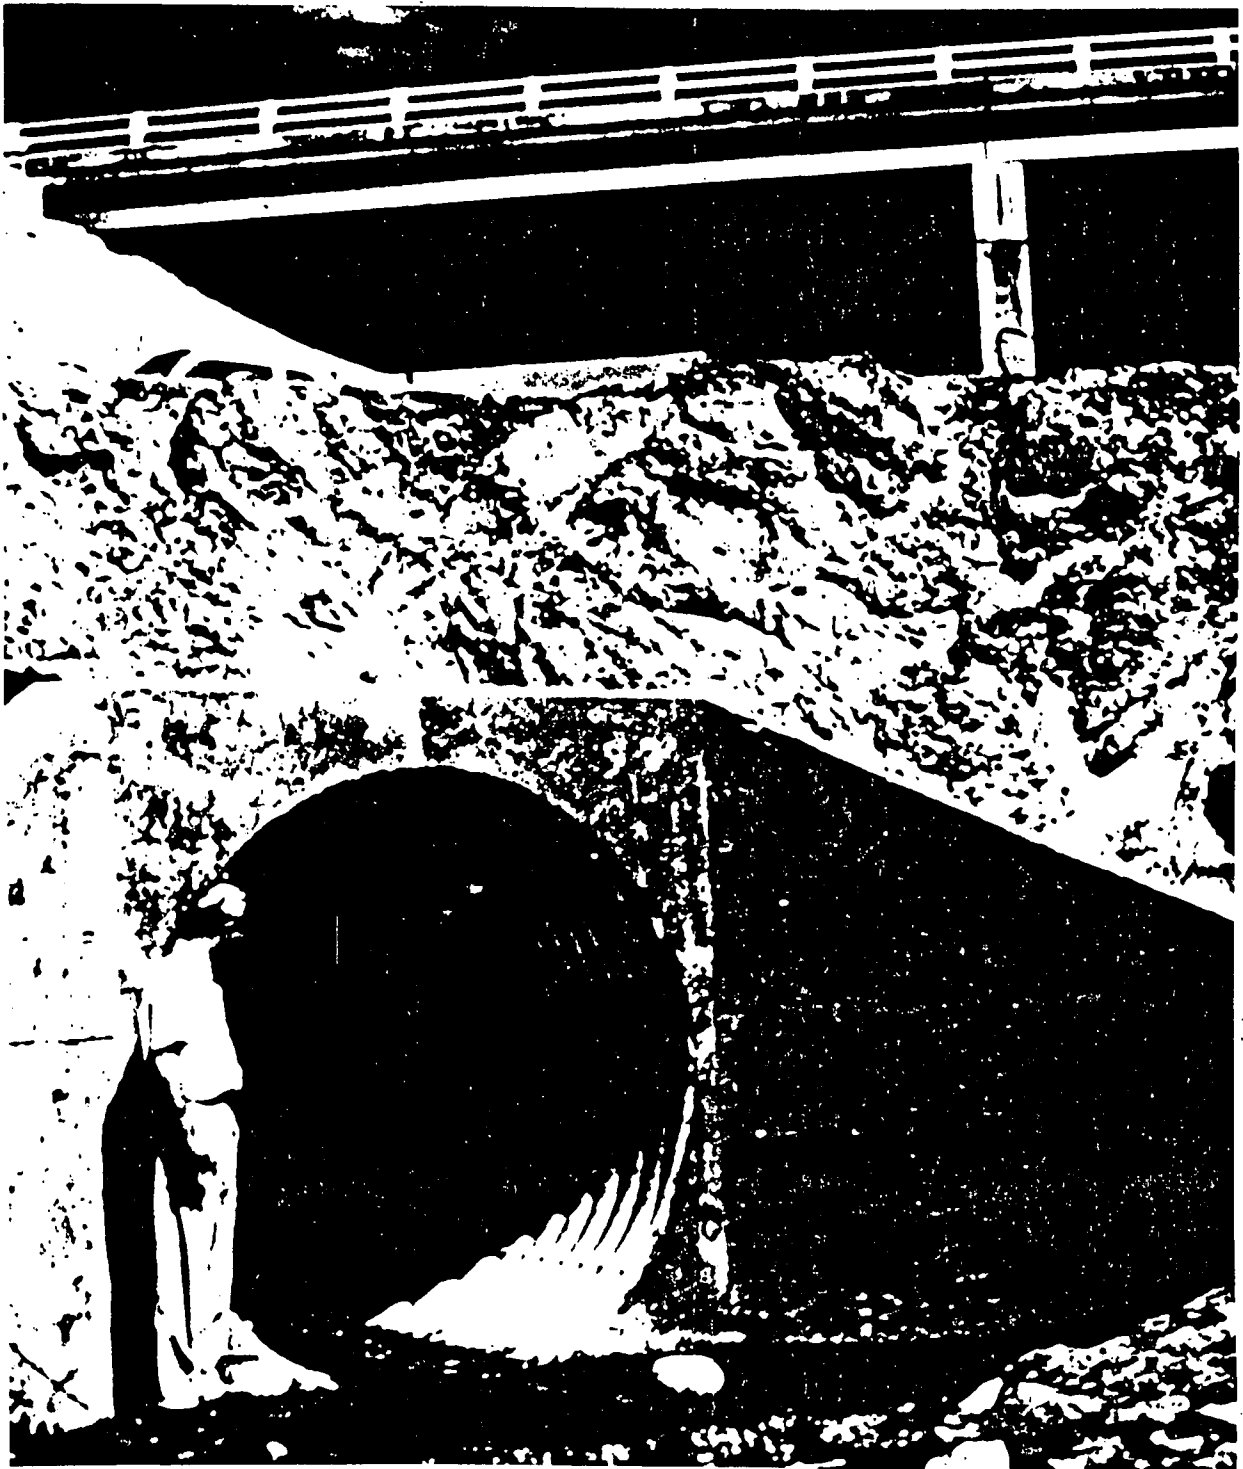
Large Culvert Installed With Little Consideration
